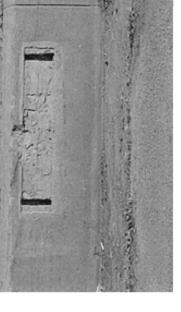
LOSSING & WOODWARD CEMENT CONTRACTORS. SW comer at Roosevelt & mid-block McKinley to Roosevelt.
